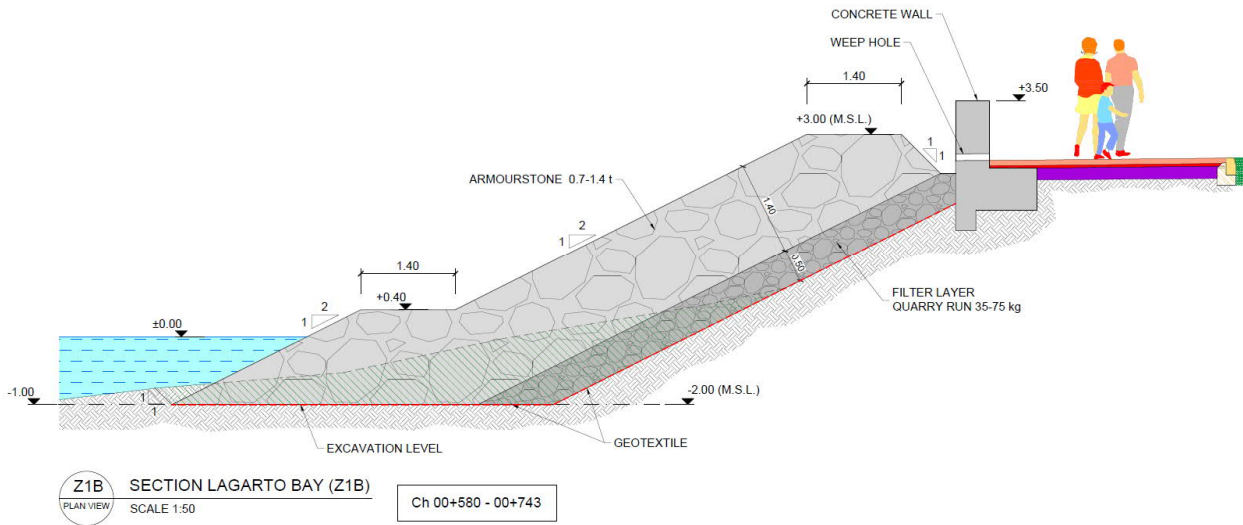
Typical cross section. Lagarto Bay (0+580 – 0+743)
